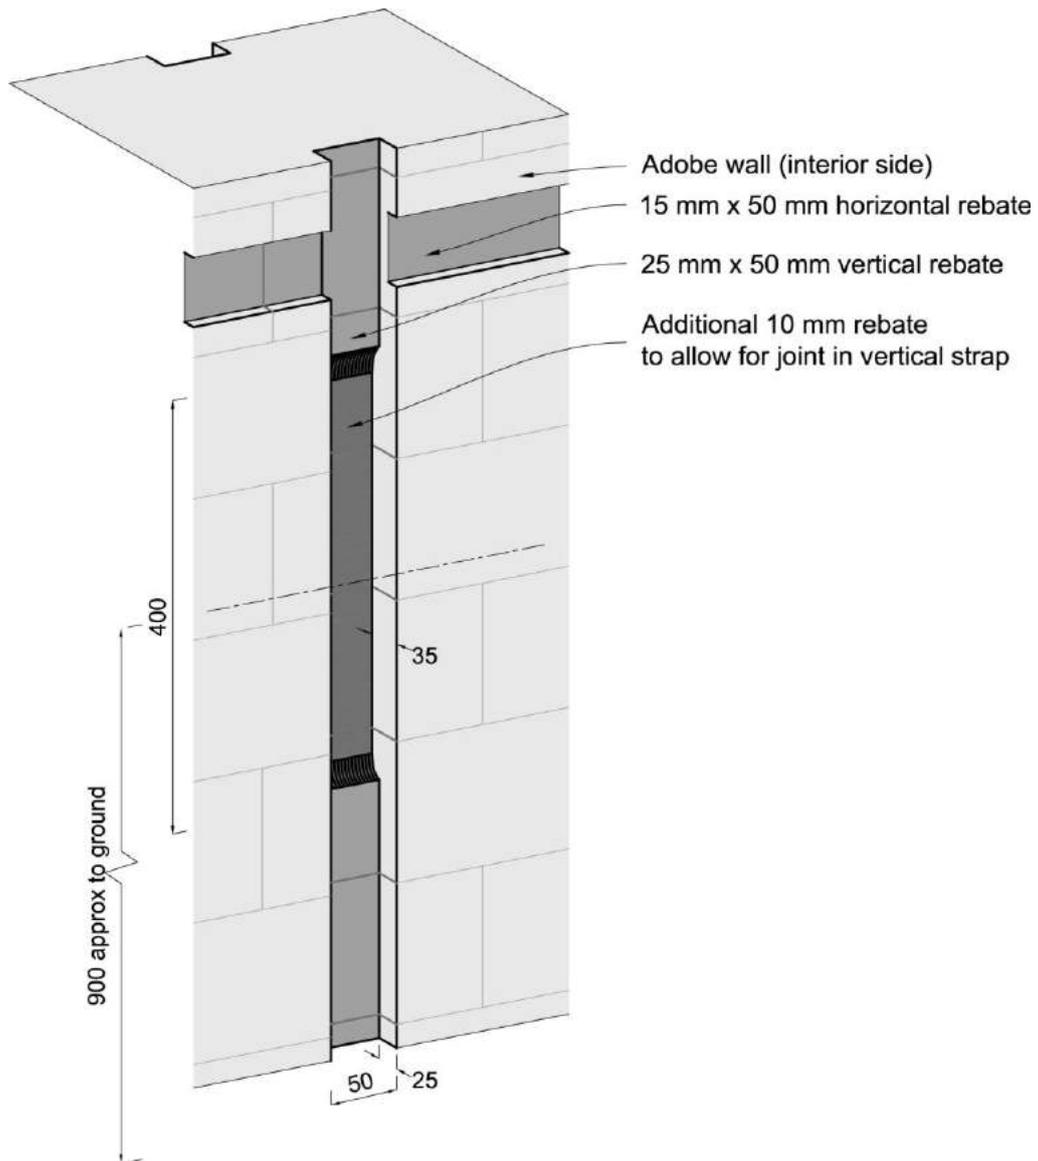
A typical vertical rebate on an inside wall surface with a deepened length for the strap joint.
